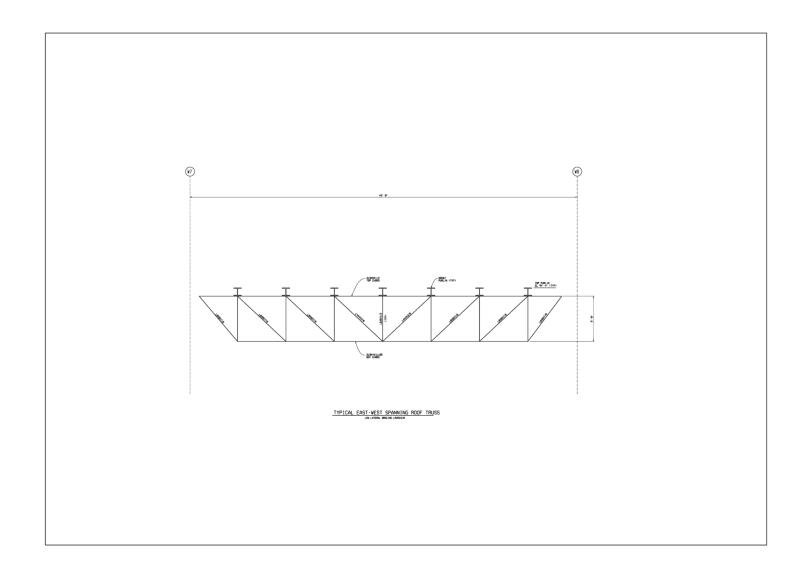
H.3-48 Typical East-West Spanning Roof Truss Between Column Lines W7-W8 (Elevation View)
